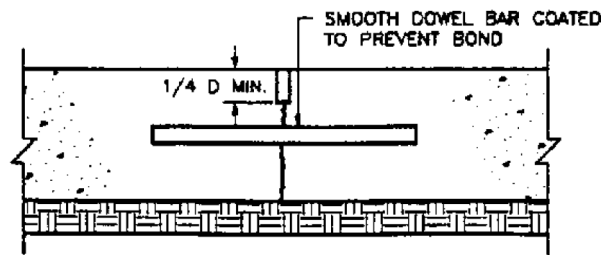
Doweled Contraction Joint (ACI 224 1995)
